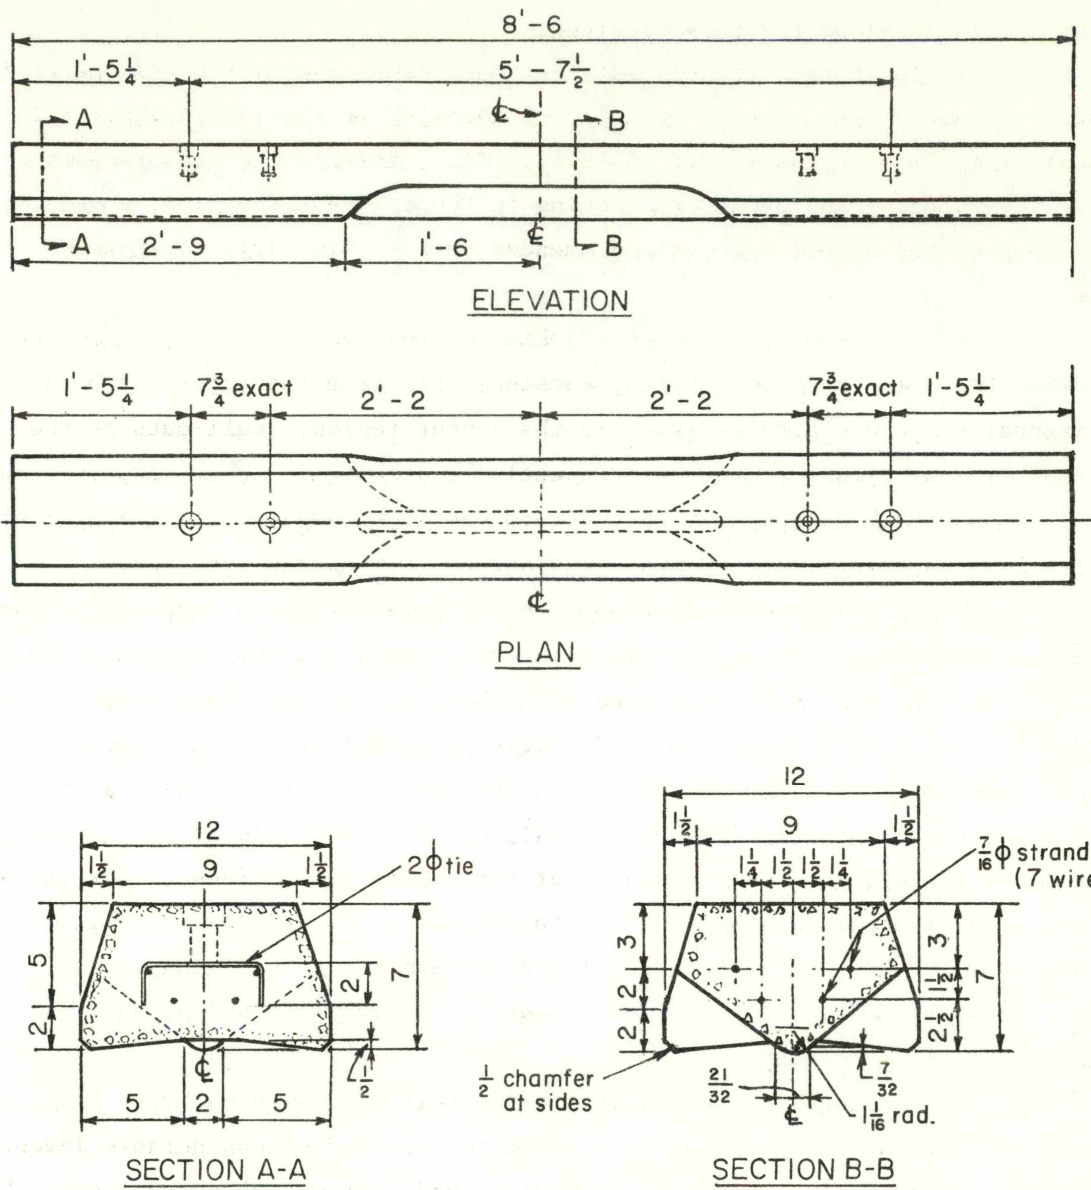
AAR TYPE E CONCRETE TIE
